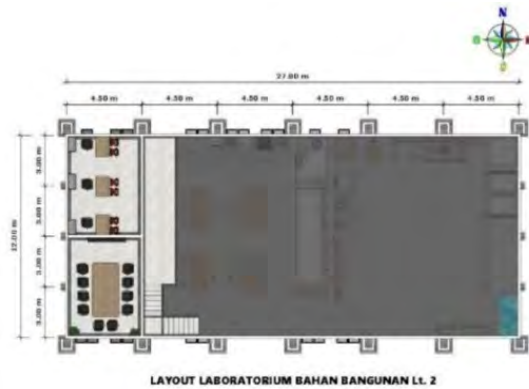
Layout of the 2nd Floor Building Materials Laboratory
